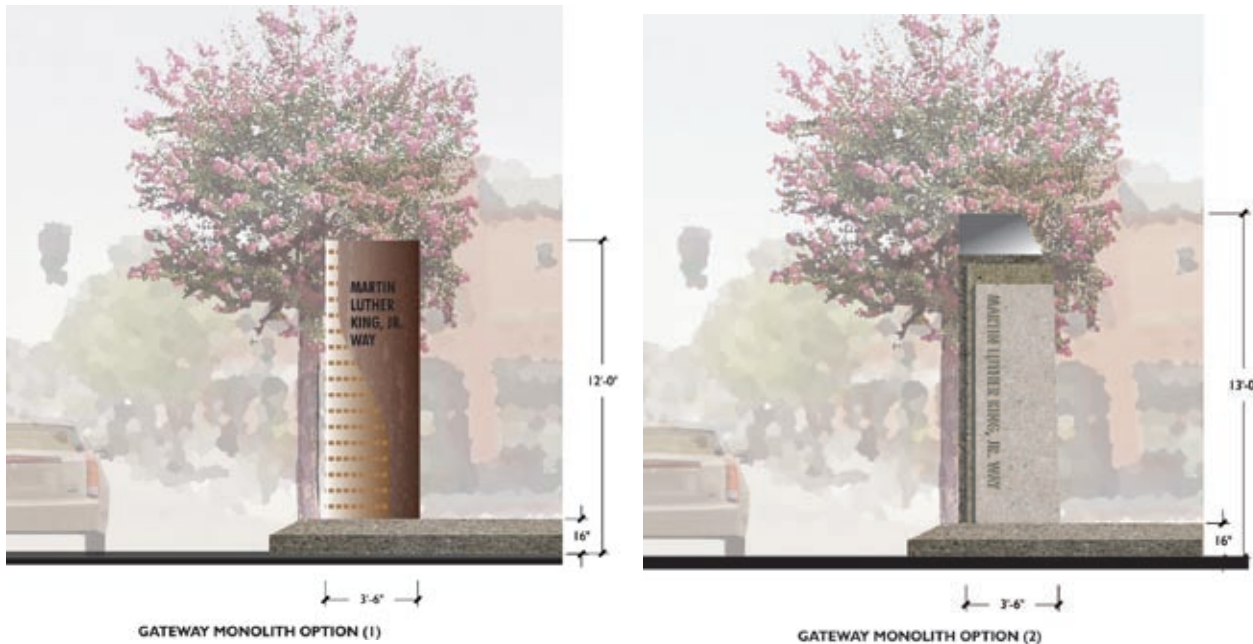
Examples of vertical gateway elements at 40th Street bulb outs
